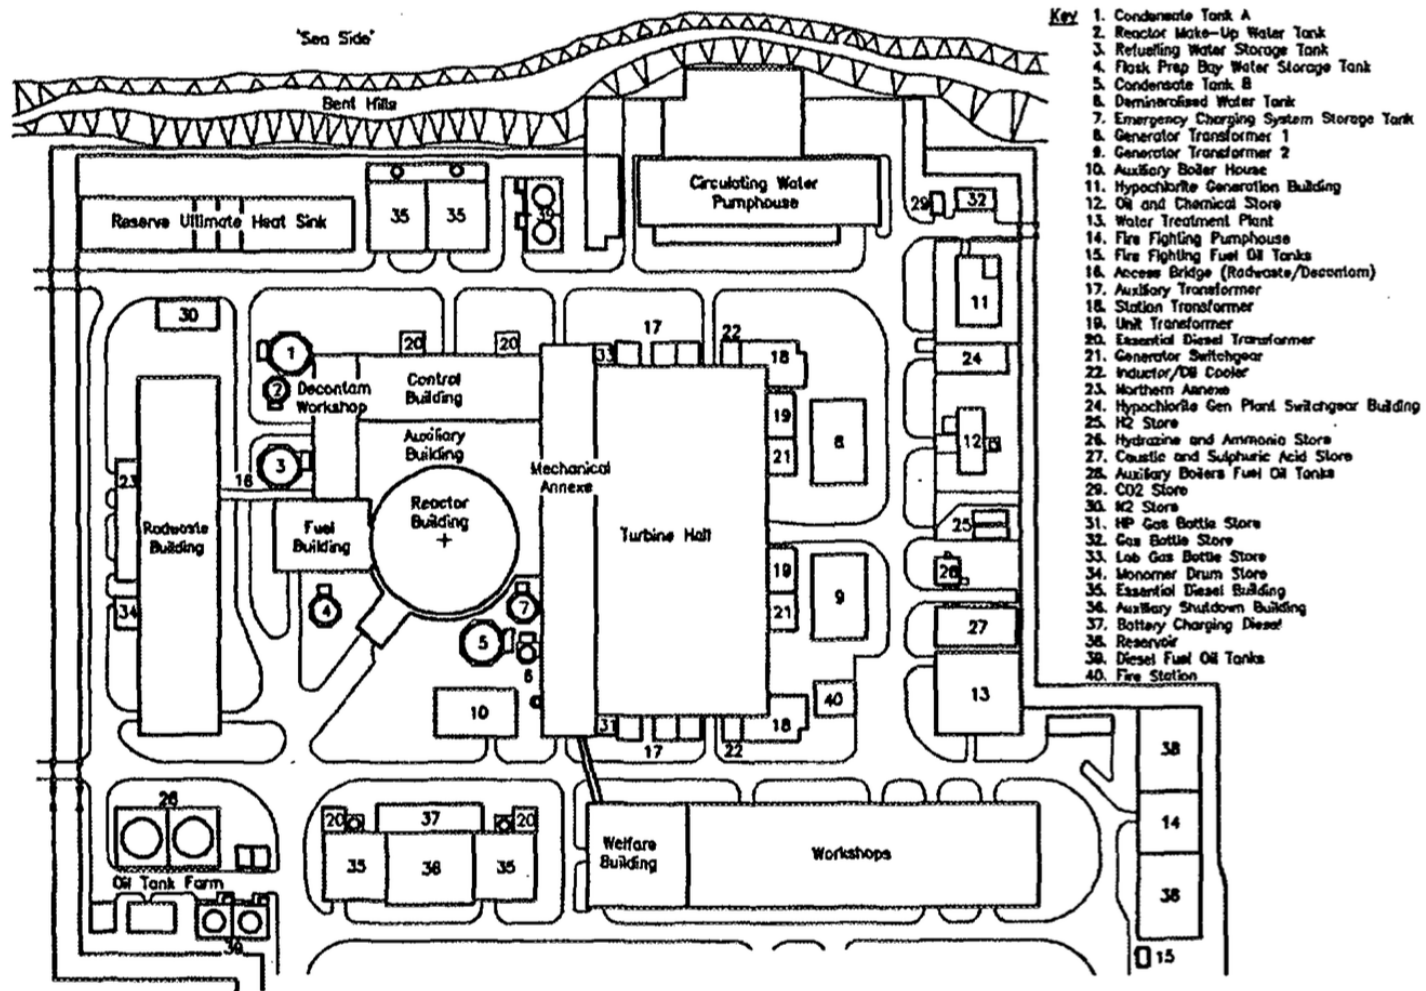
Layout of Sizewell B power station site Suffolk, UK (Figure 2 [70]).
